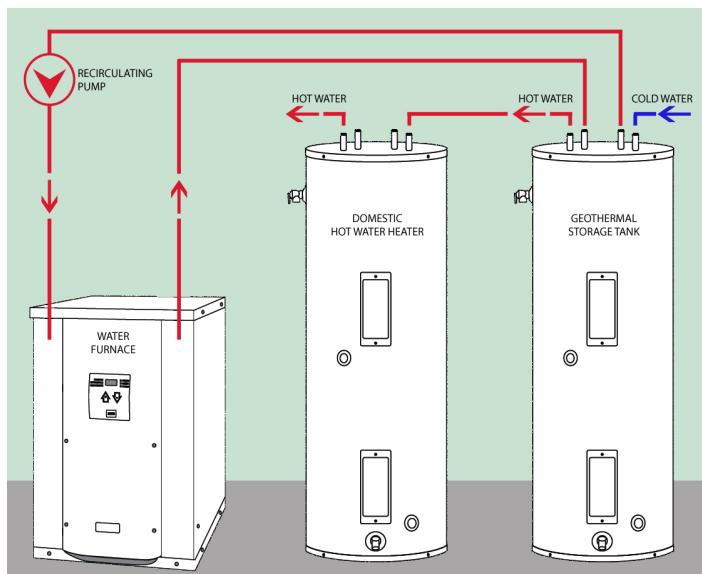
Geothermal Domestic Water Source Heat Pump Piping Schematic
